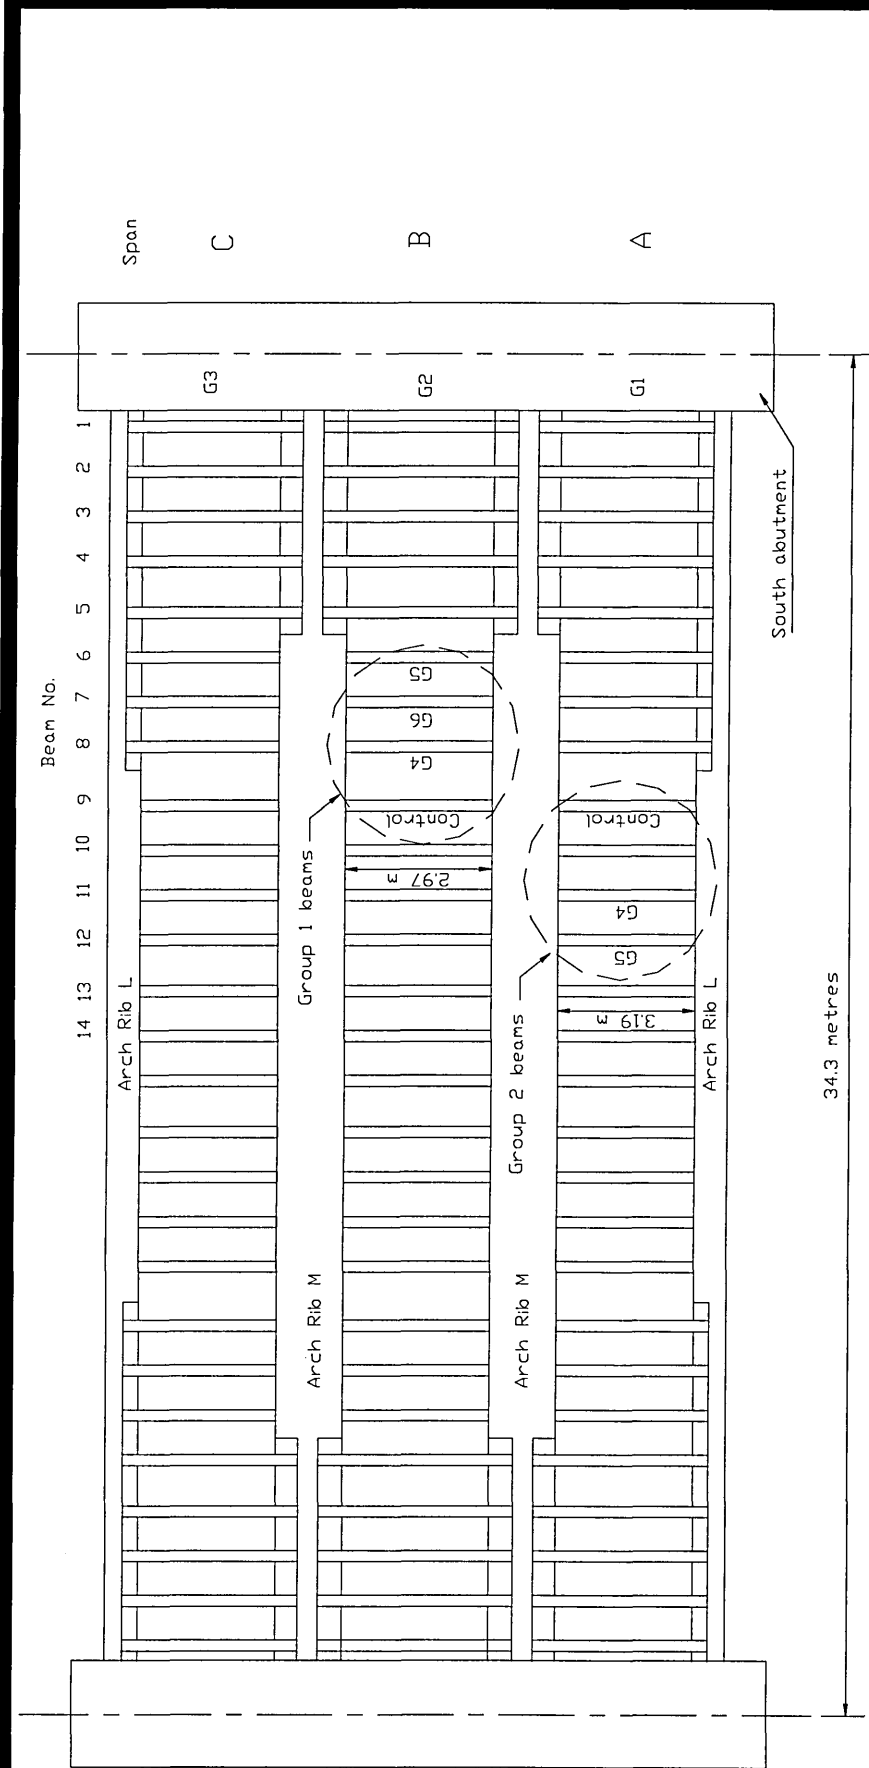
Location of instrumented repairs on south span at Gunthorpe Bridge
